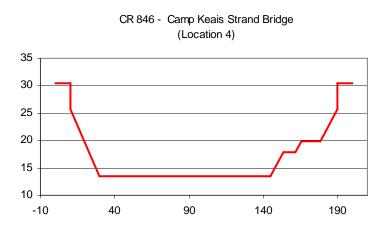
Geometry of the New Bridge on CR-846 at Camp Keais Strand (Location 4). View Looking North.
